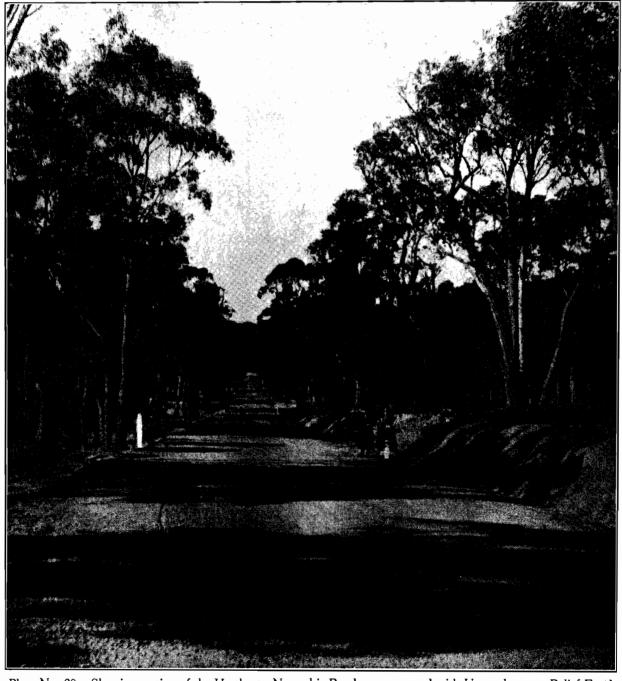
Showing section of the Heathcote-Nagambie Road reconstructed with Unemployment Relief Funds.
